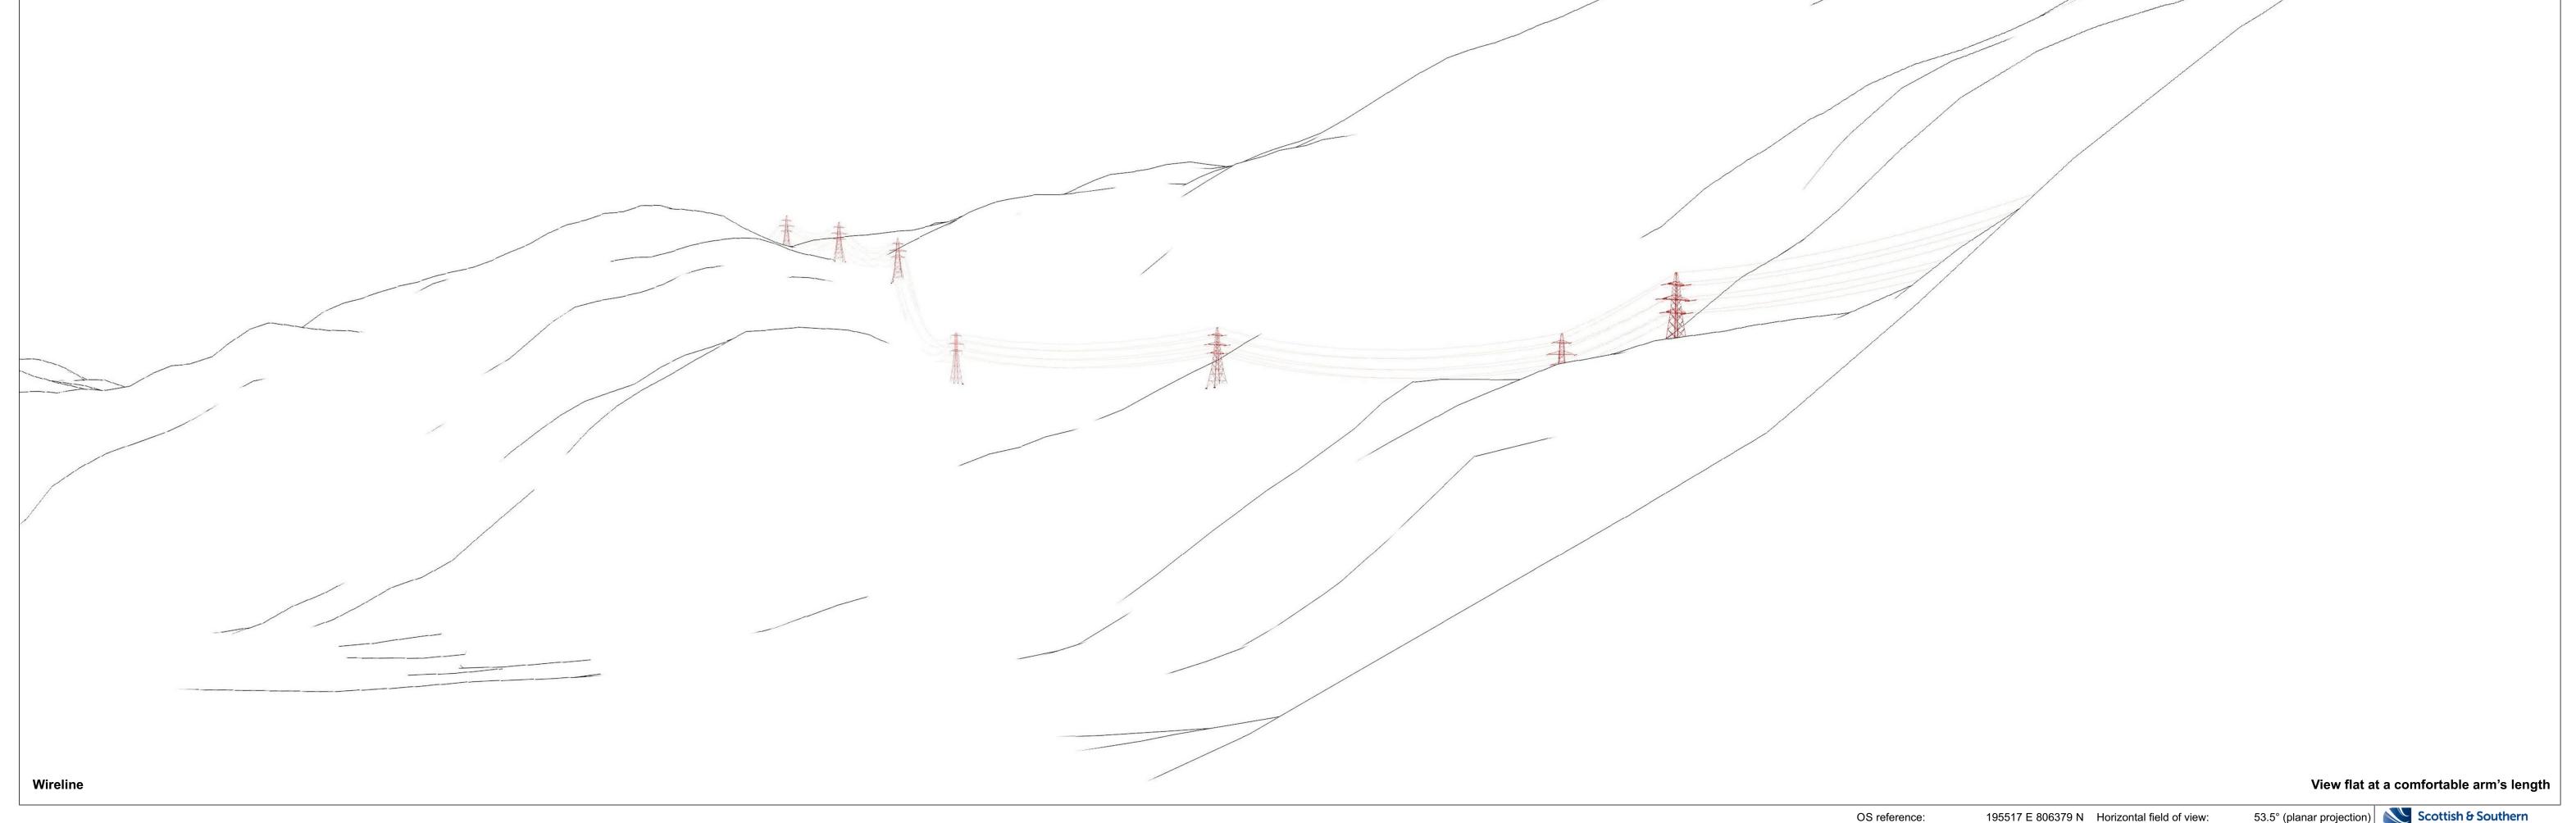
Viewpoint 15: Road Above Kinloch Hourn, Wireline (Preferred Alignment and Design Solution)
